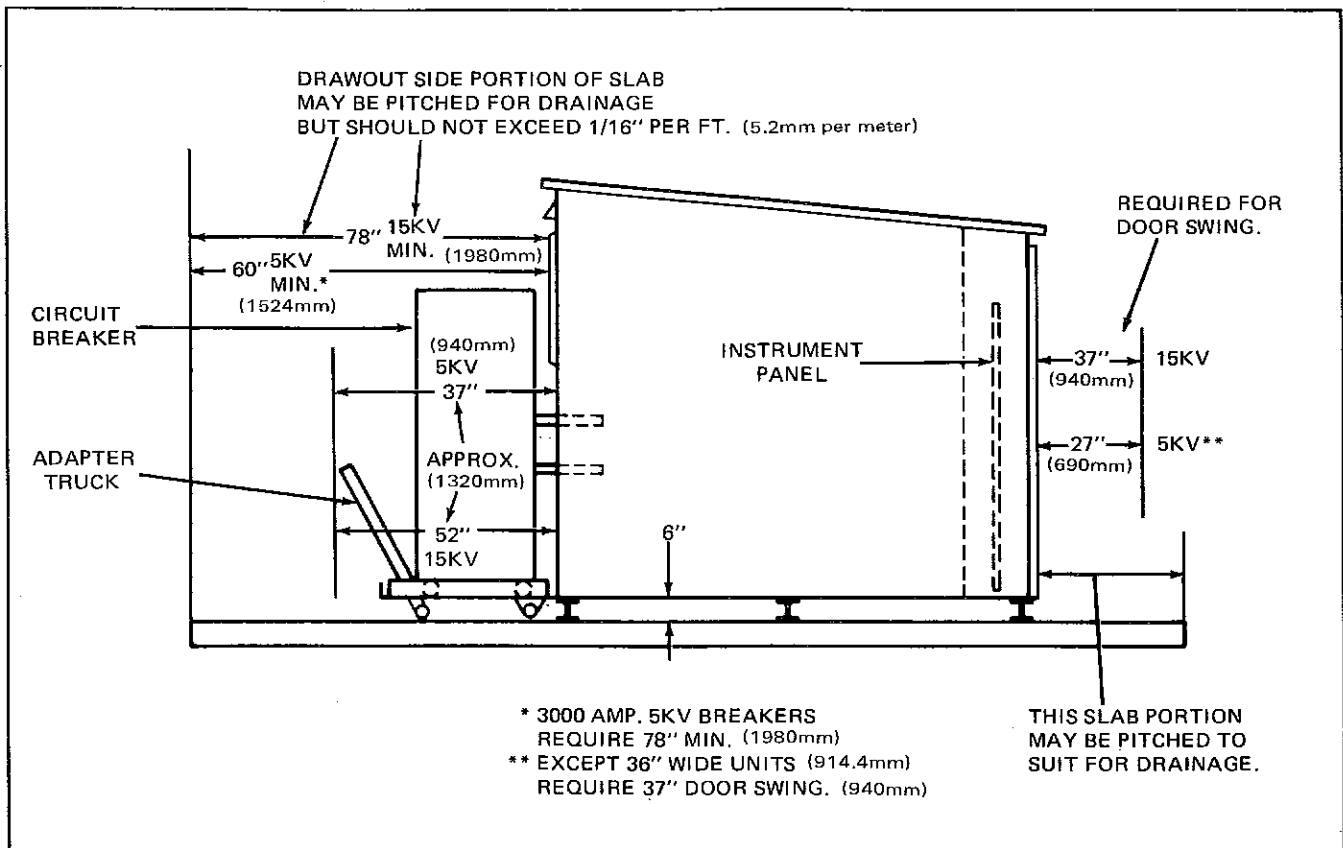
Recommended Work Spaces for Conventional Outdoor Switchgear
